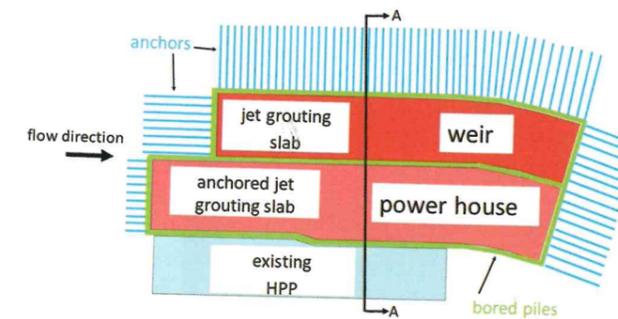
Plan view of excavation pits at the existing hydropower plant
